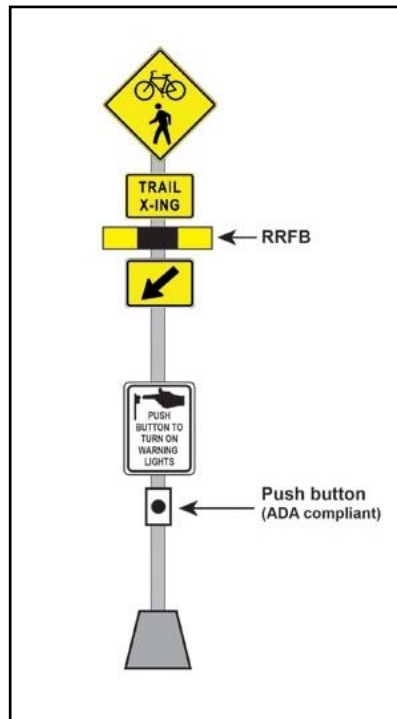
Rectangular Rapid Flashing Beacon (RRFB)
